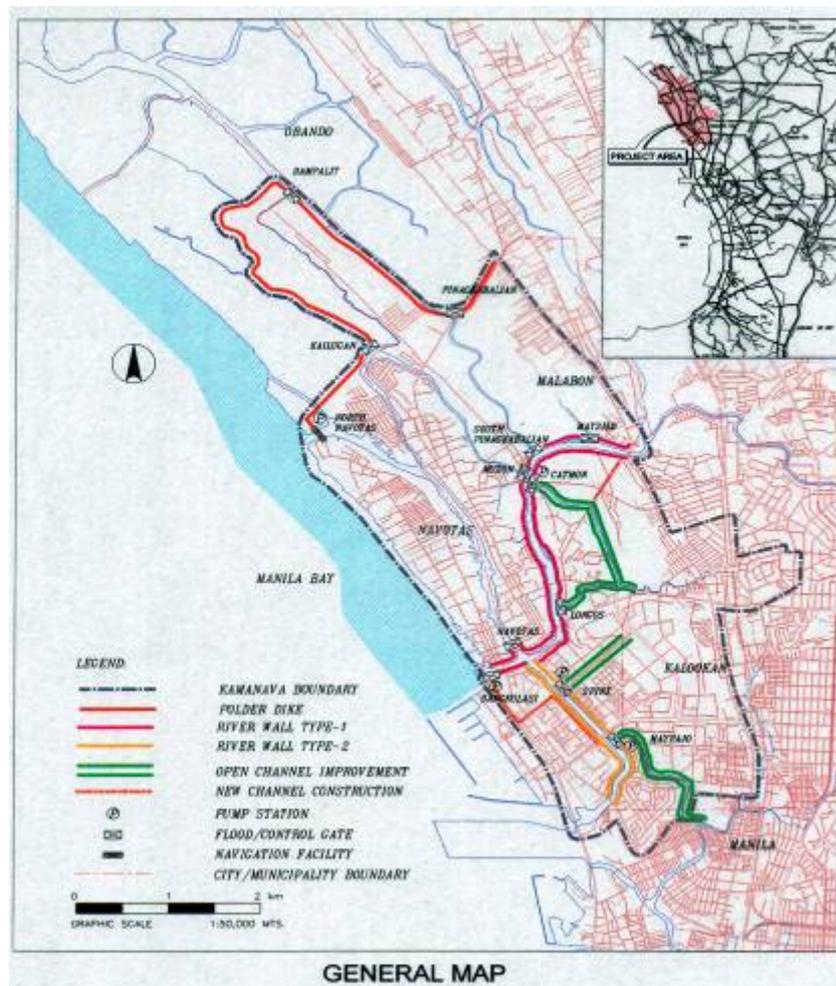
KAMANAVA Area Flood Control and Drainage System Improvement Project
